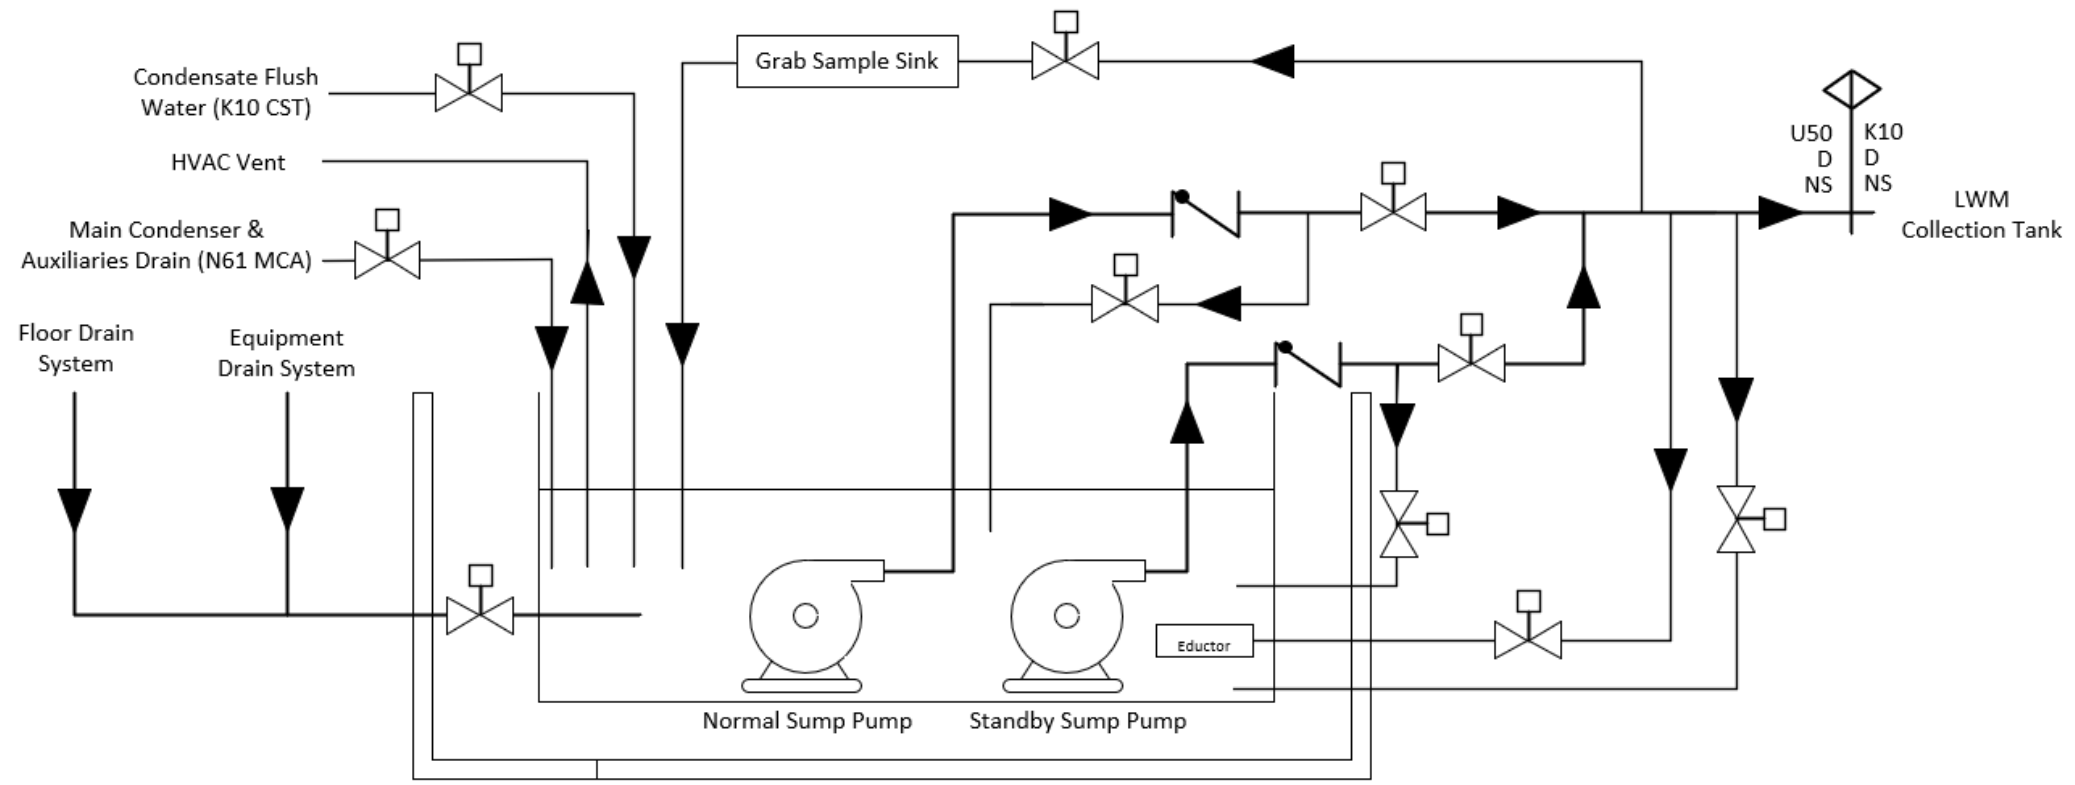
A-21: Floor Drain System Drain Sump (Typical)
